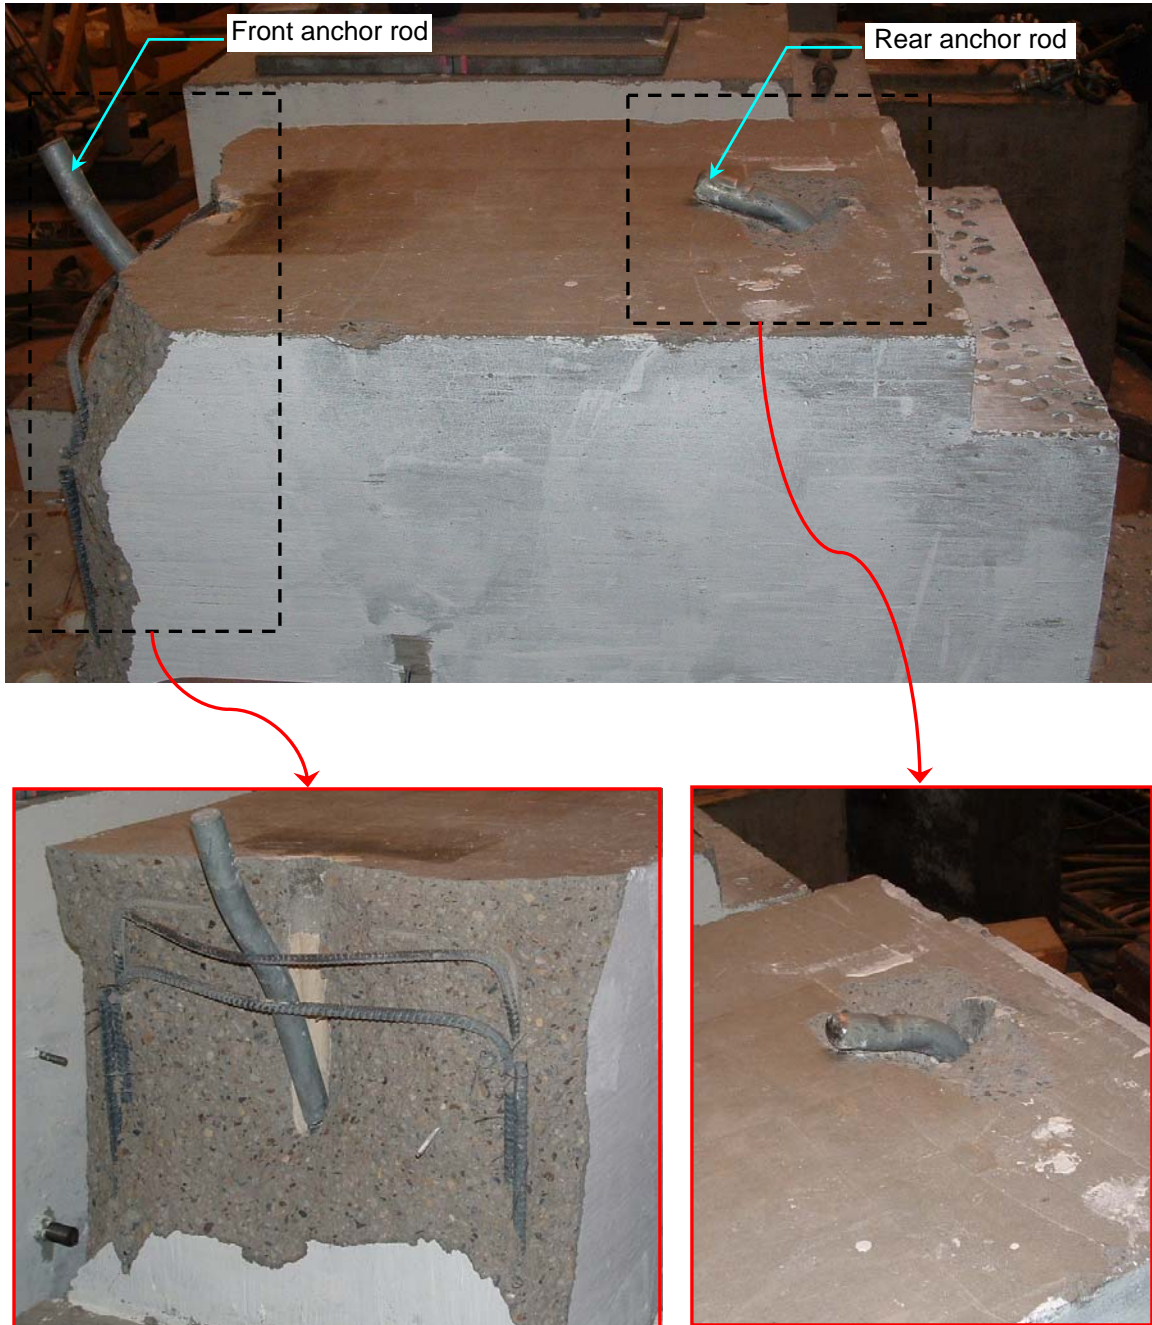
Damage in bottom concrete block and anchor rods after load testing.
